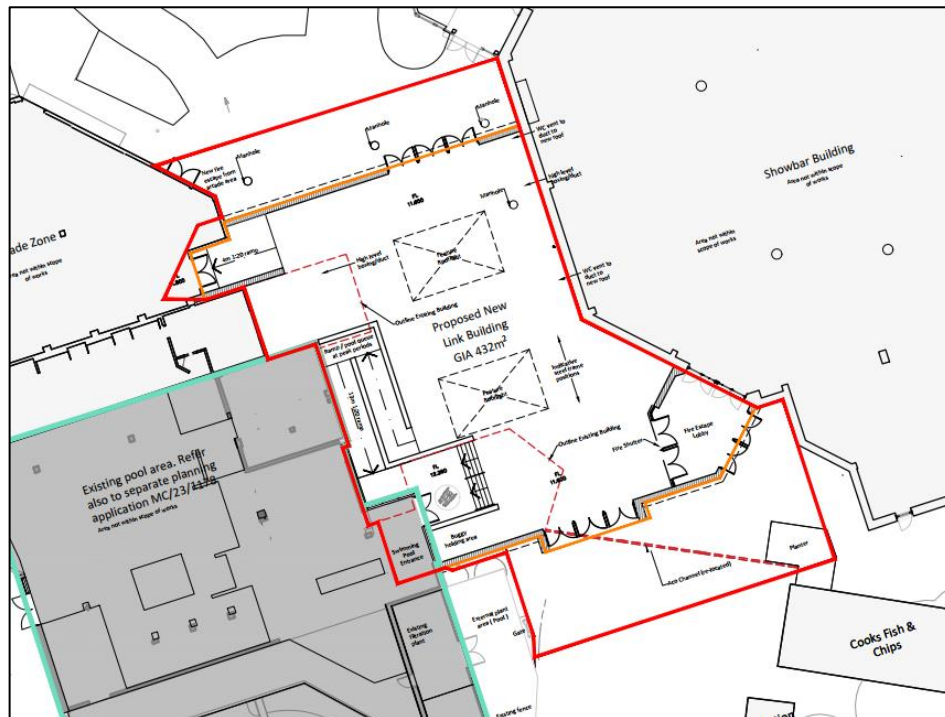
Development Proposals – full drawings within Appendix 1
